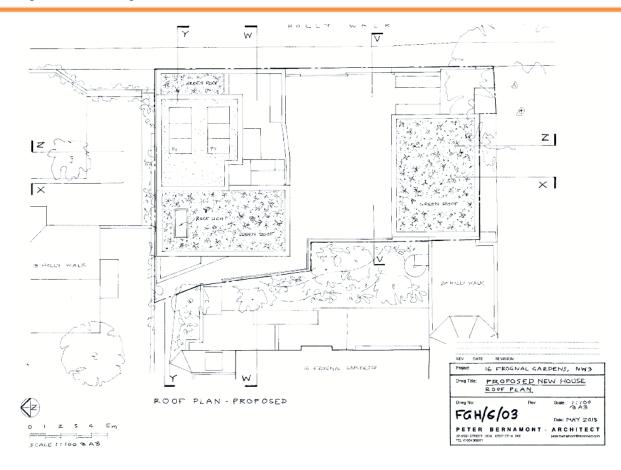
Floor Plans of the proposed Frognal Gardens residential development
